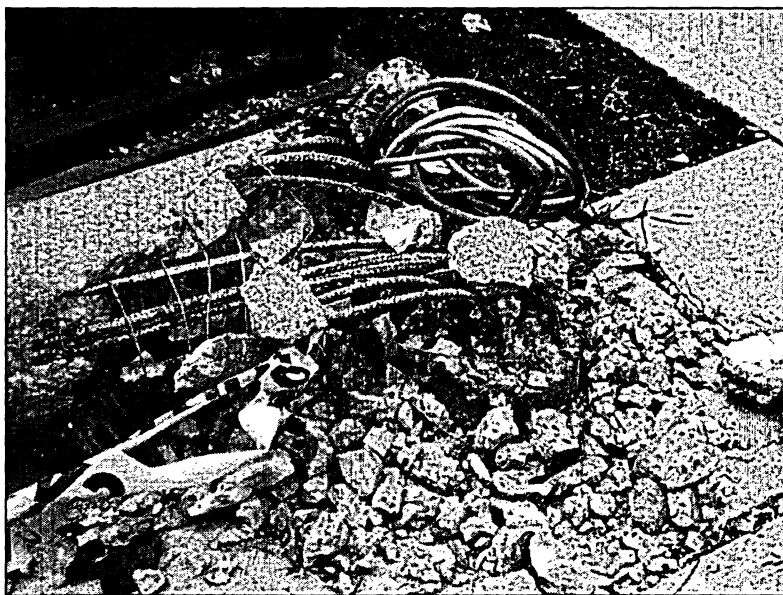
Close up view a of pre-stressed concrete light pole after a brittle failure
